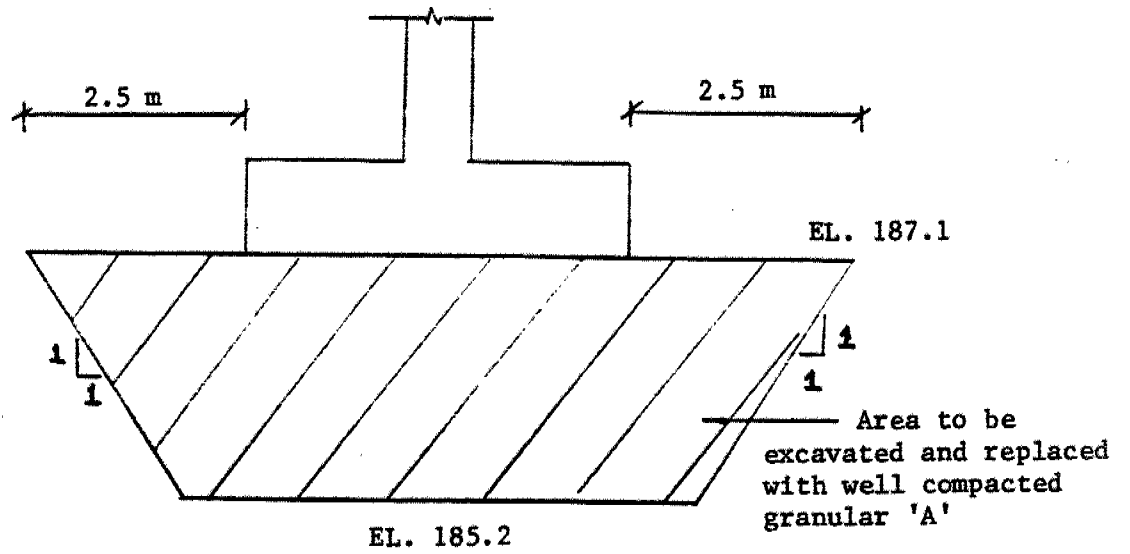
RETAINING WALL FOOTING REQUIREMENTS
